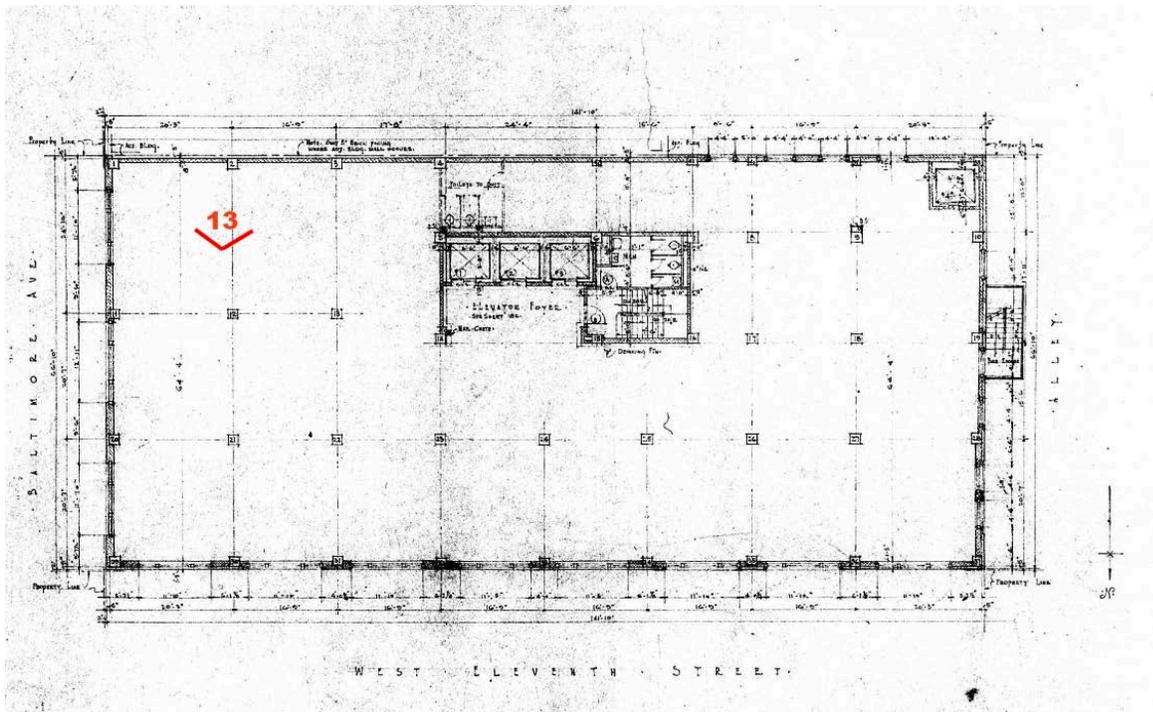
(above): Photo Key eighth floor. Figure 7 (below): Photo Key, eleventh floor
